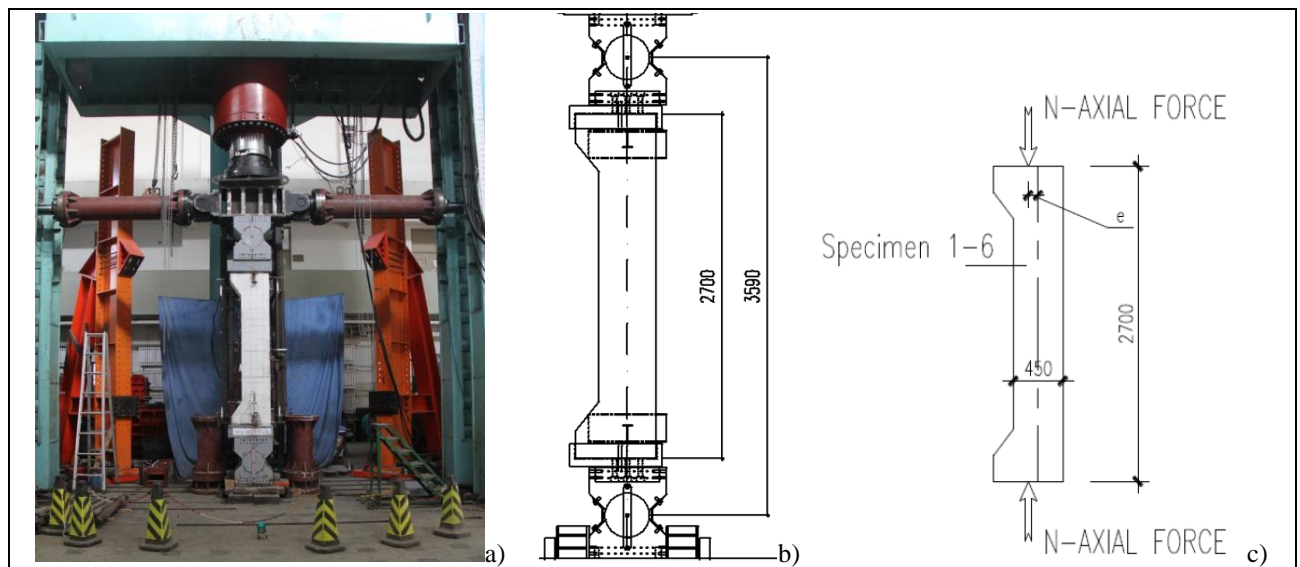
Phase 1: Test setup: a) static setup in laboratory b) boundary conditions; c) load application.
